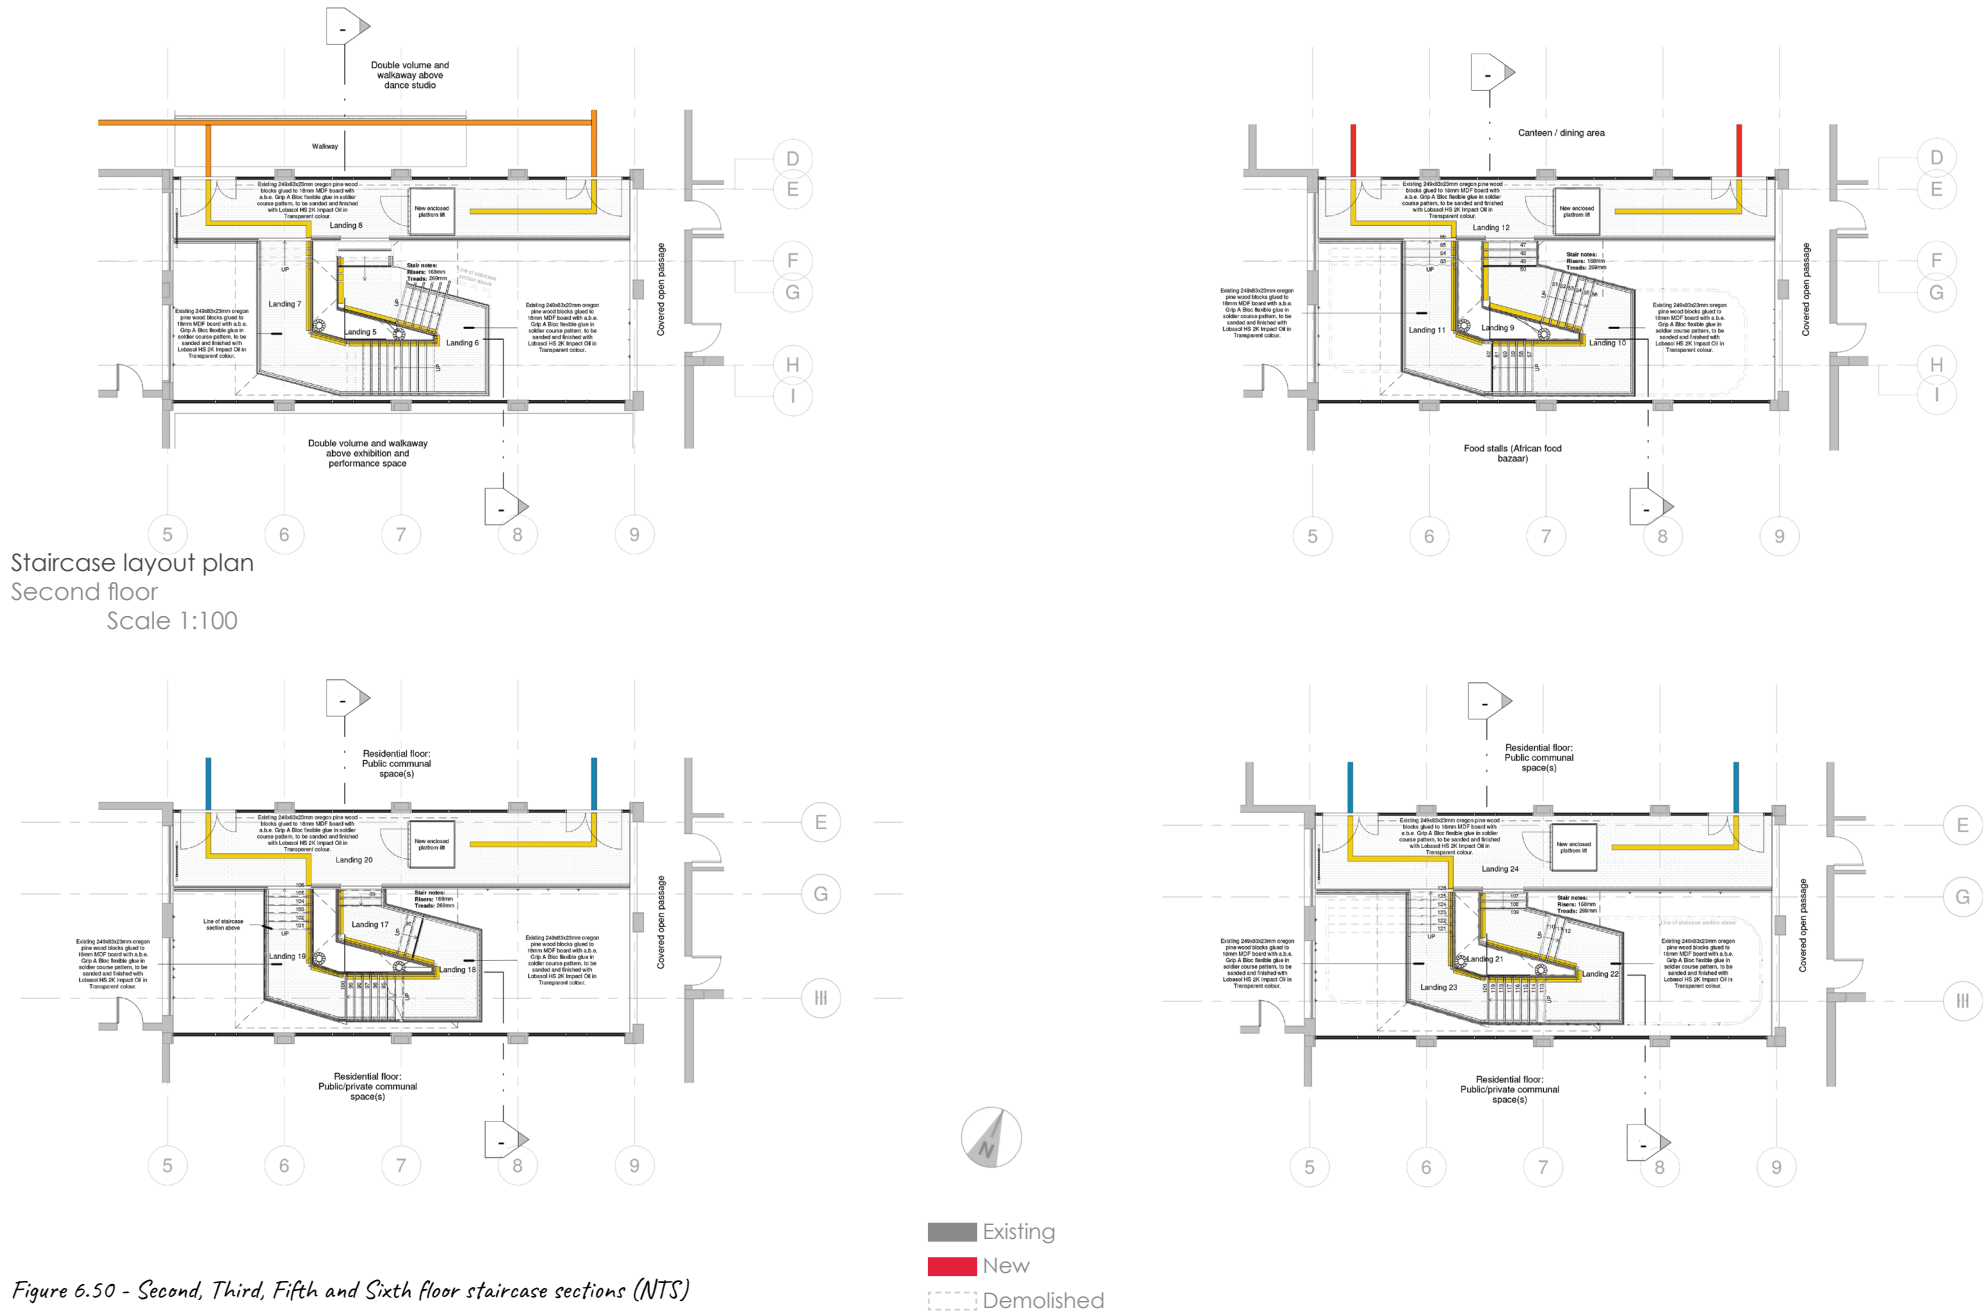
Second, Third, Fifth and Sixth floor staircase sections (NTS)
